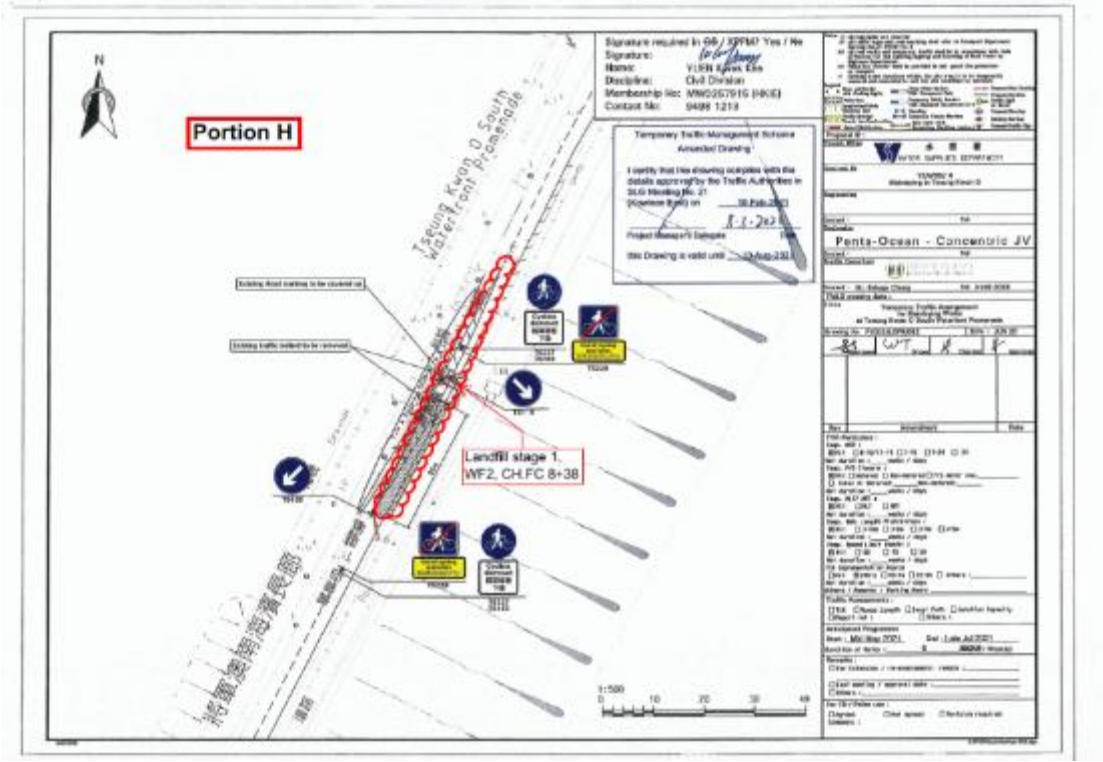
Location Plan – Landfill Stage 1 (Area FC8+38)
